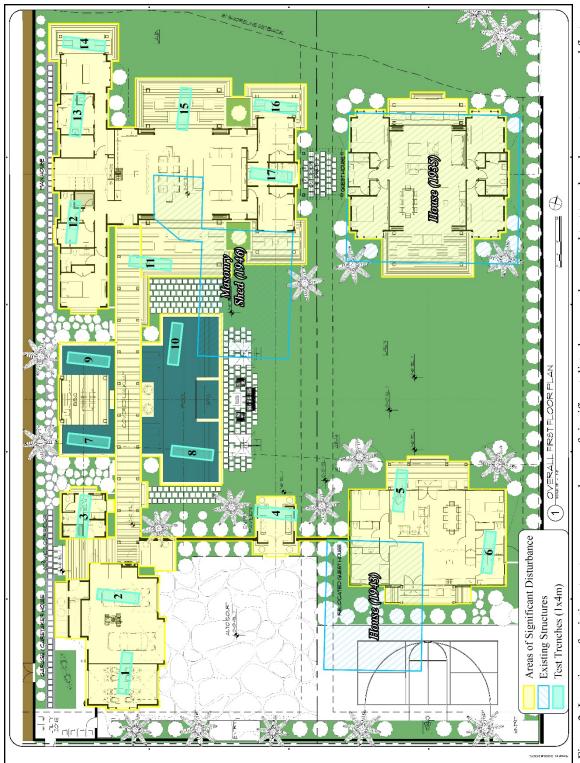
Locations of existing structures, proposed areas of significant disturbance, and proposed test trenches shown atop proposed first floor construction plans.
